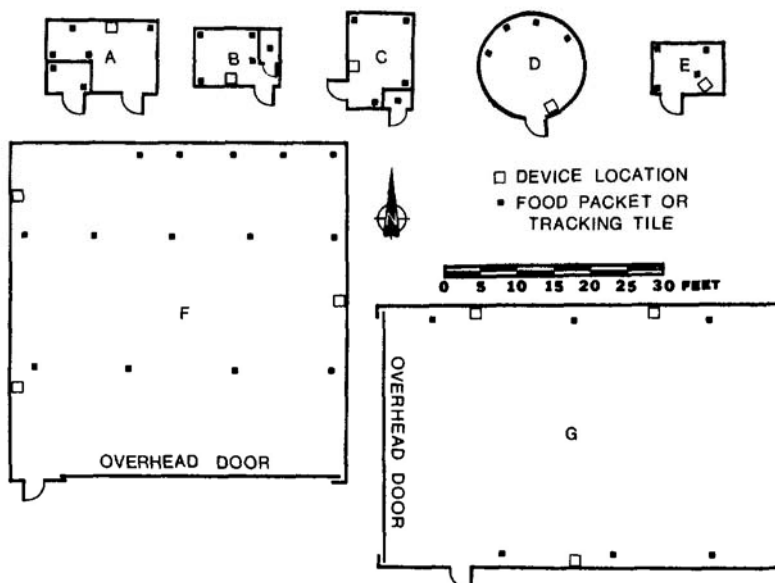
Floor diagrams of the seven field test structures. The three pump houses (A, B, C) were wood buildings with concrete floor areas of 13.9, 8.9, and 10.8 sq m. A steel grain storage building (D) had a metal floor with an area of 16.4 sq m and the small wood building (E) had an area of 6.5 sq m. Two large steel buildings (F and G) had concrete or dirt floors with areas of 196.5 and 183.9 sq m respectively.
